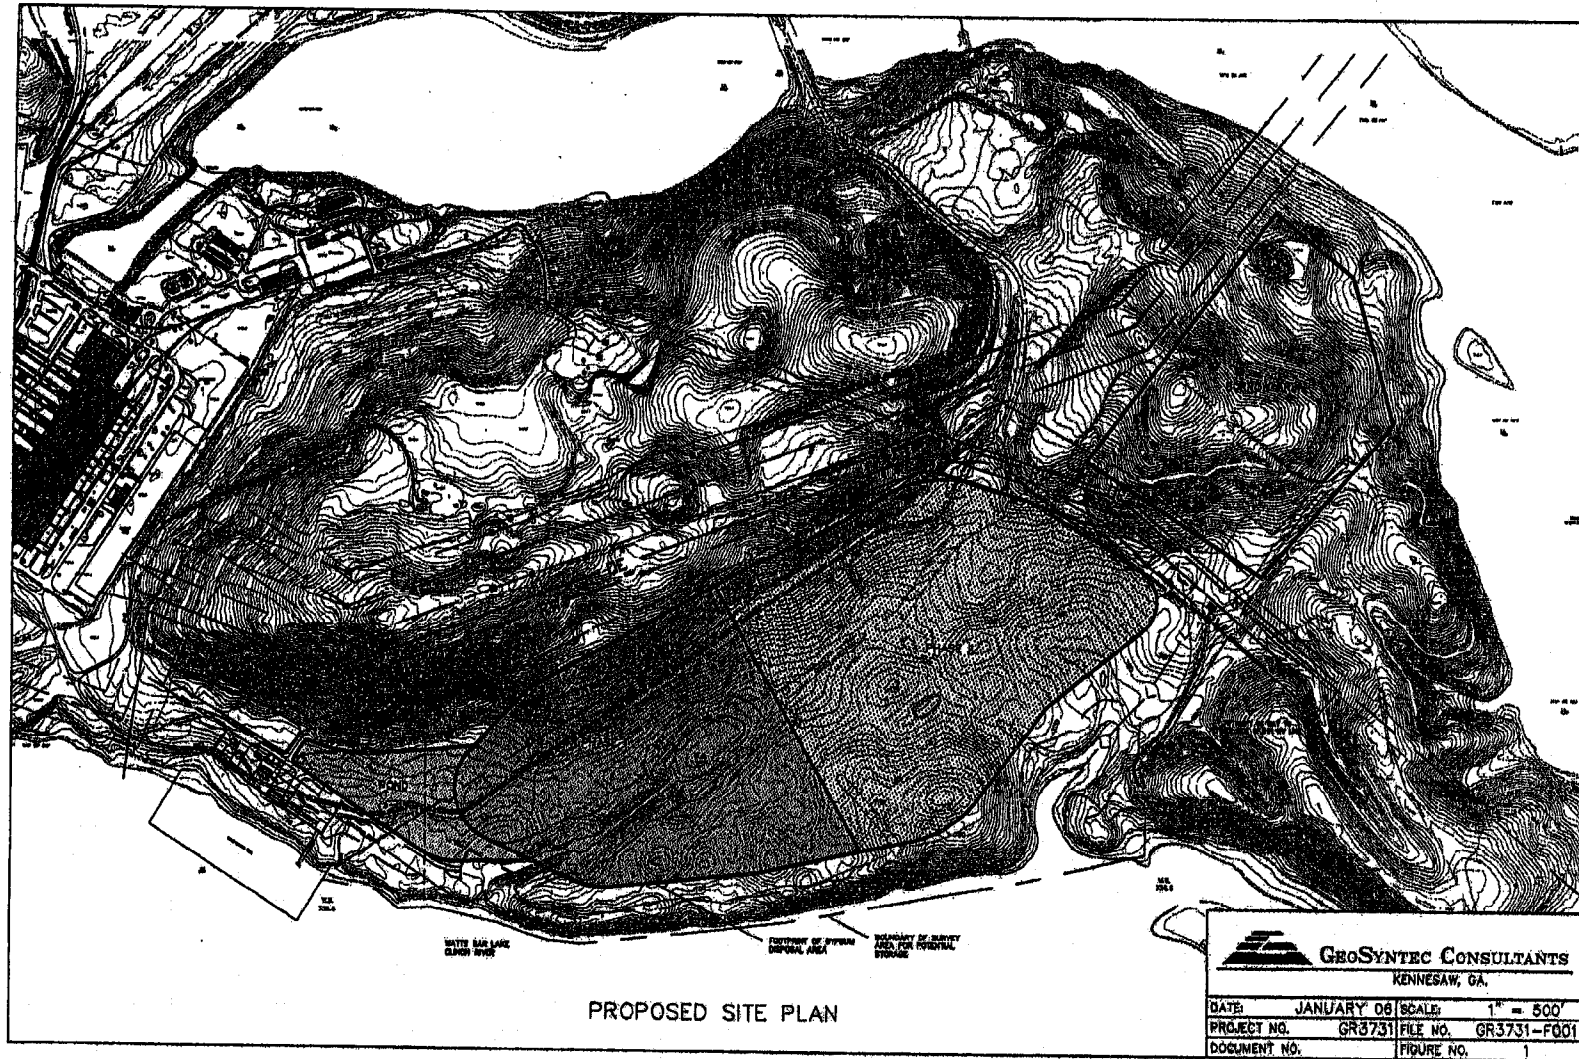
presents an overall site plan identifying key elements of the proposed CCB disposal facility. Initial activities (prior to waste disposal) will involve construction of the stormwater pond, geologic buffer, central drainage corridor, initial soil dikes, and associated stormwater diversion features associated with development of the Phase I area of the Site.
